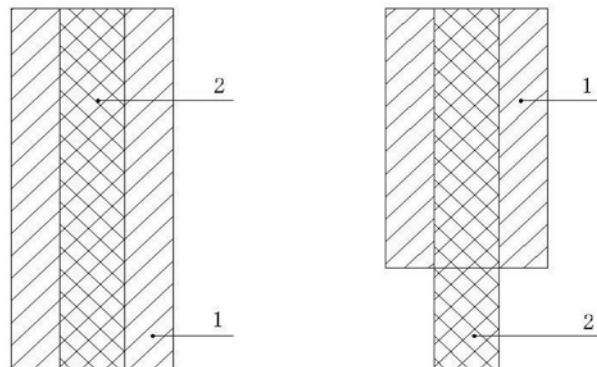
Layout of Precast Pile Planting. 1 – Outer pile (Concrete, cement mortar or soil cement); 2 – Core pile (Precast concrete pile).
